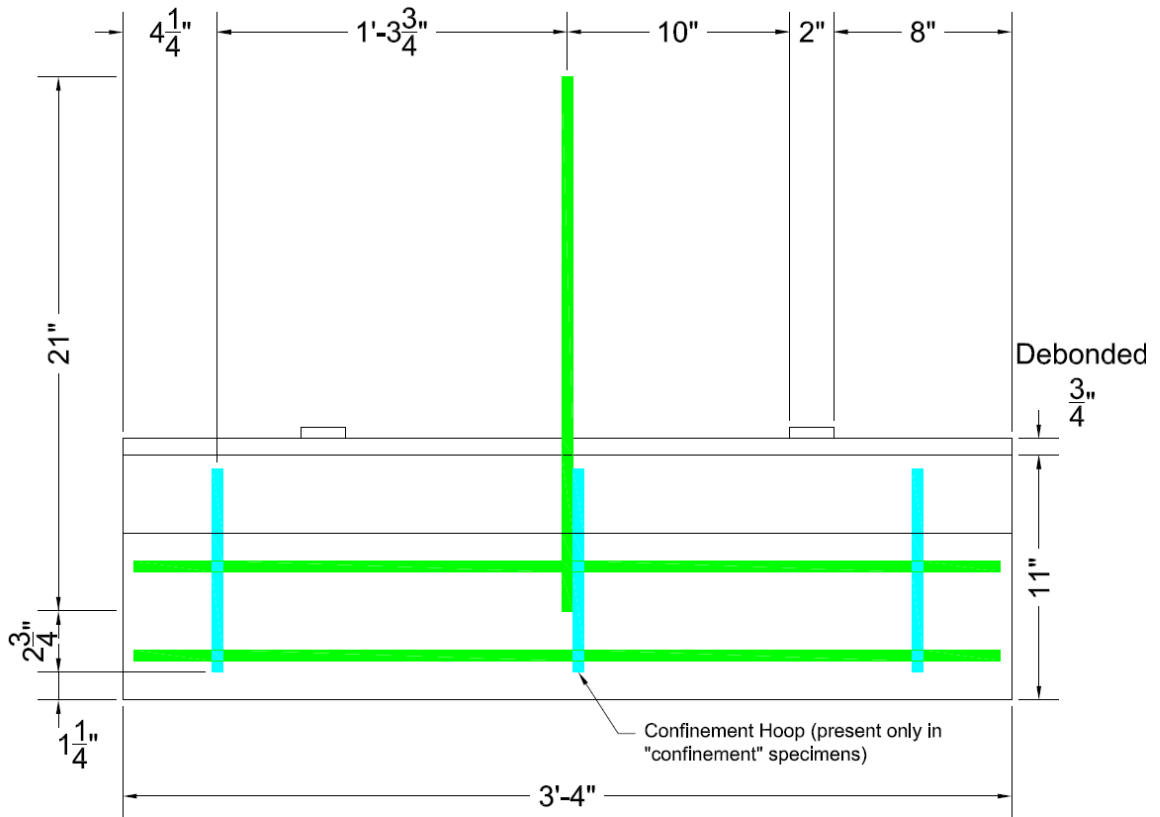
Side view of M-shaped subassembly specimen showing typical placement of confinement hoops.
